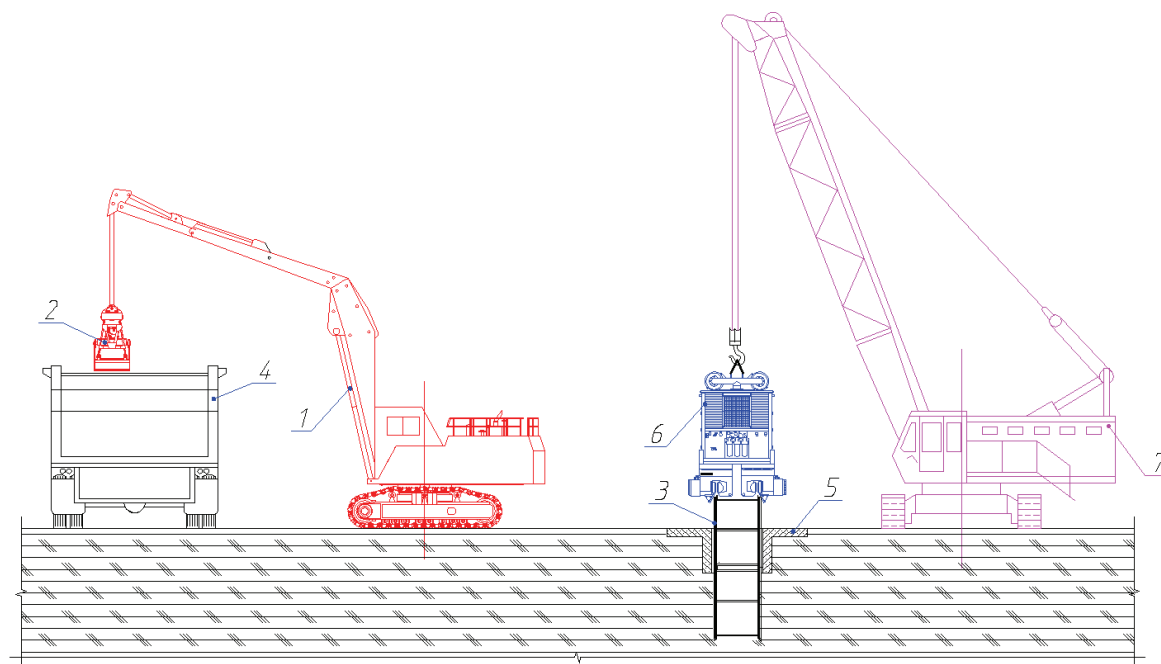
Technological scheme of vibrating immersion of the immovable formwork in the ground: 1 – an excavator for soil excavating; 2 – a clamshell equipment on the pressure bar; 3 – an immovable metal formwork; 4 – a truck; 5 – is a guide wall; 6 – a vibro-loader B-402; 7 – a vibrating grab.
